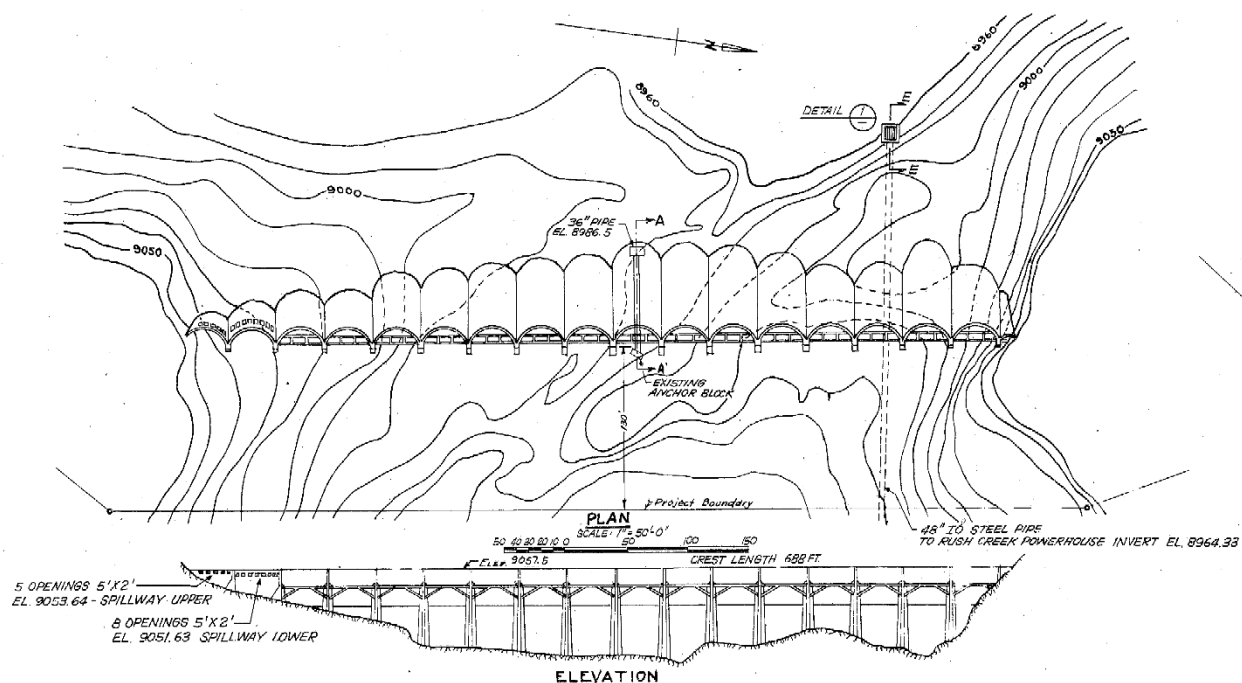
Exhibit F engineering drawing showing Gem Dam elevations and 10-foot contours in the vicinity of the dam.
